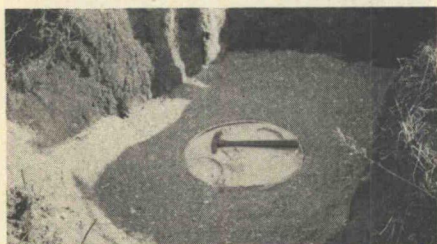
View showing pit filled with sand. Note the four (4) pins on which elevations were observed as the test progressed.
